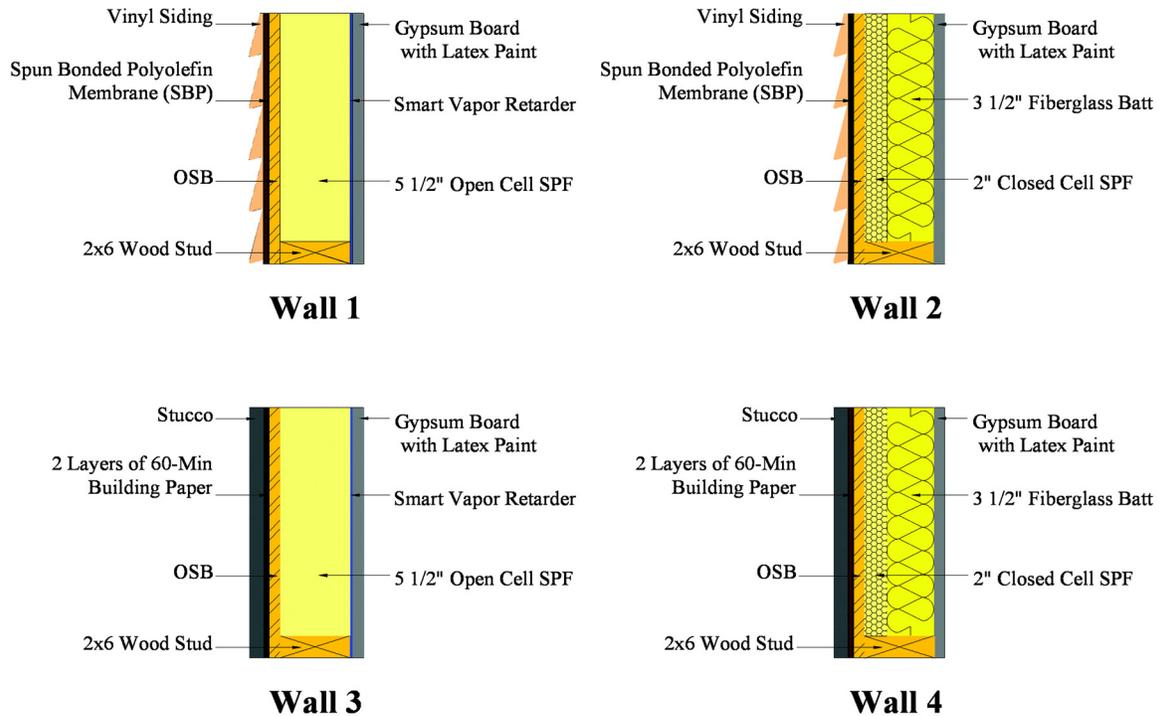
Cross sections of modeled wall systems (wood studs not modeled).
